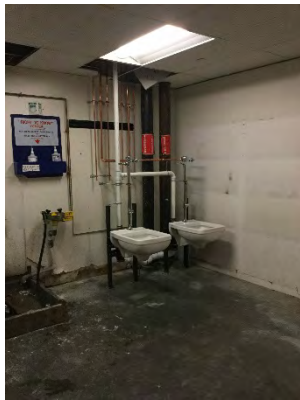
Soiled Utility Room – Two Soiled Utility Sinks with Proper Plumbing Installed
